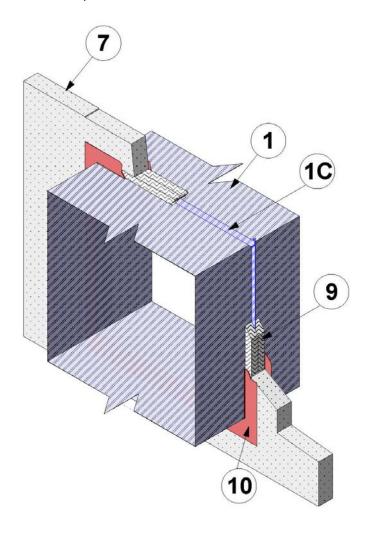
Penetration Firestops for Wall Supporting Constructions
